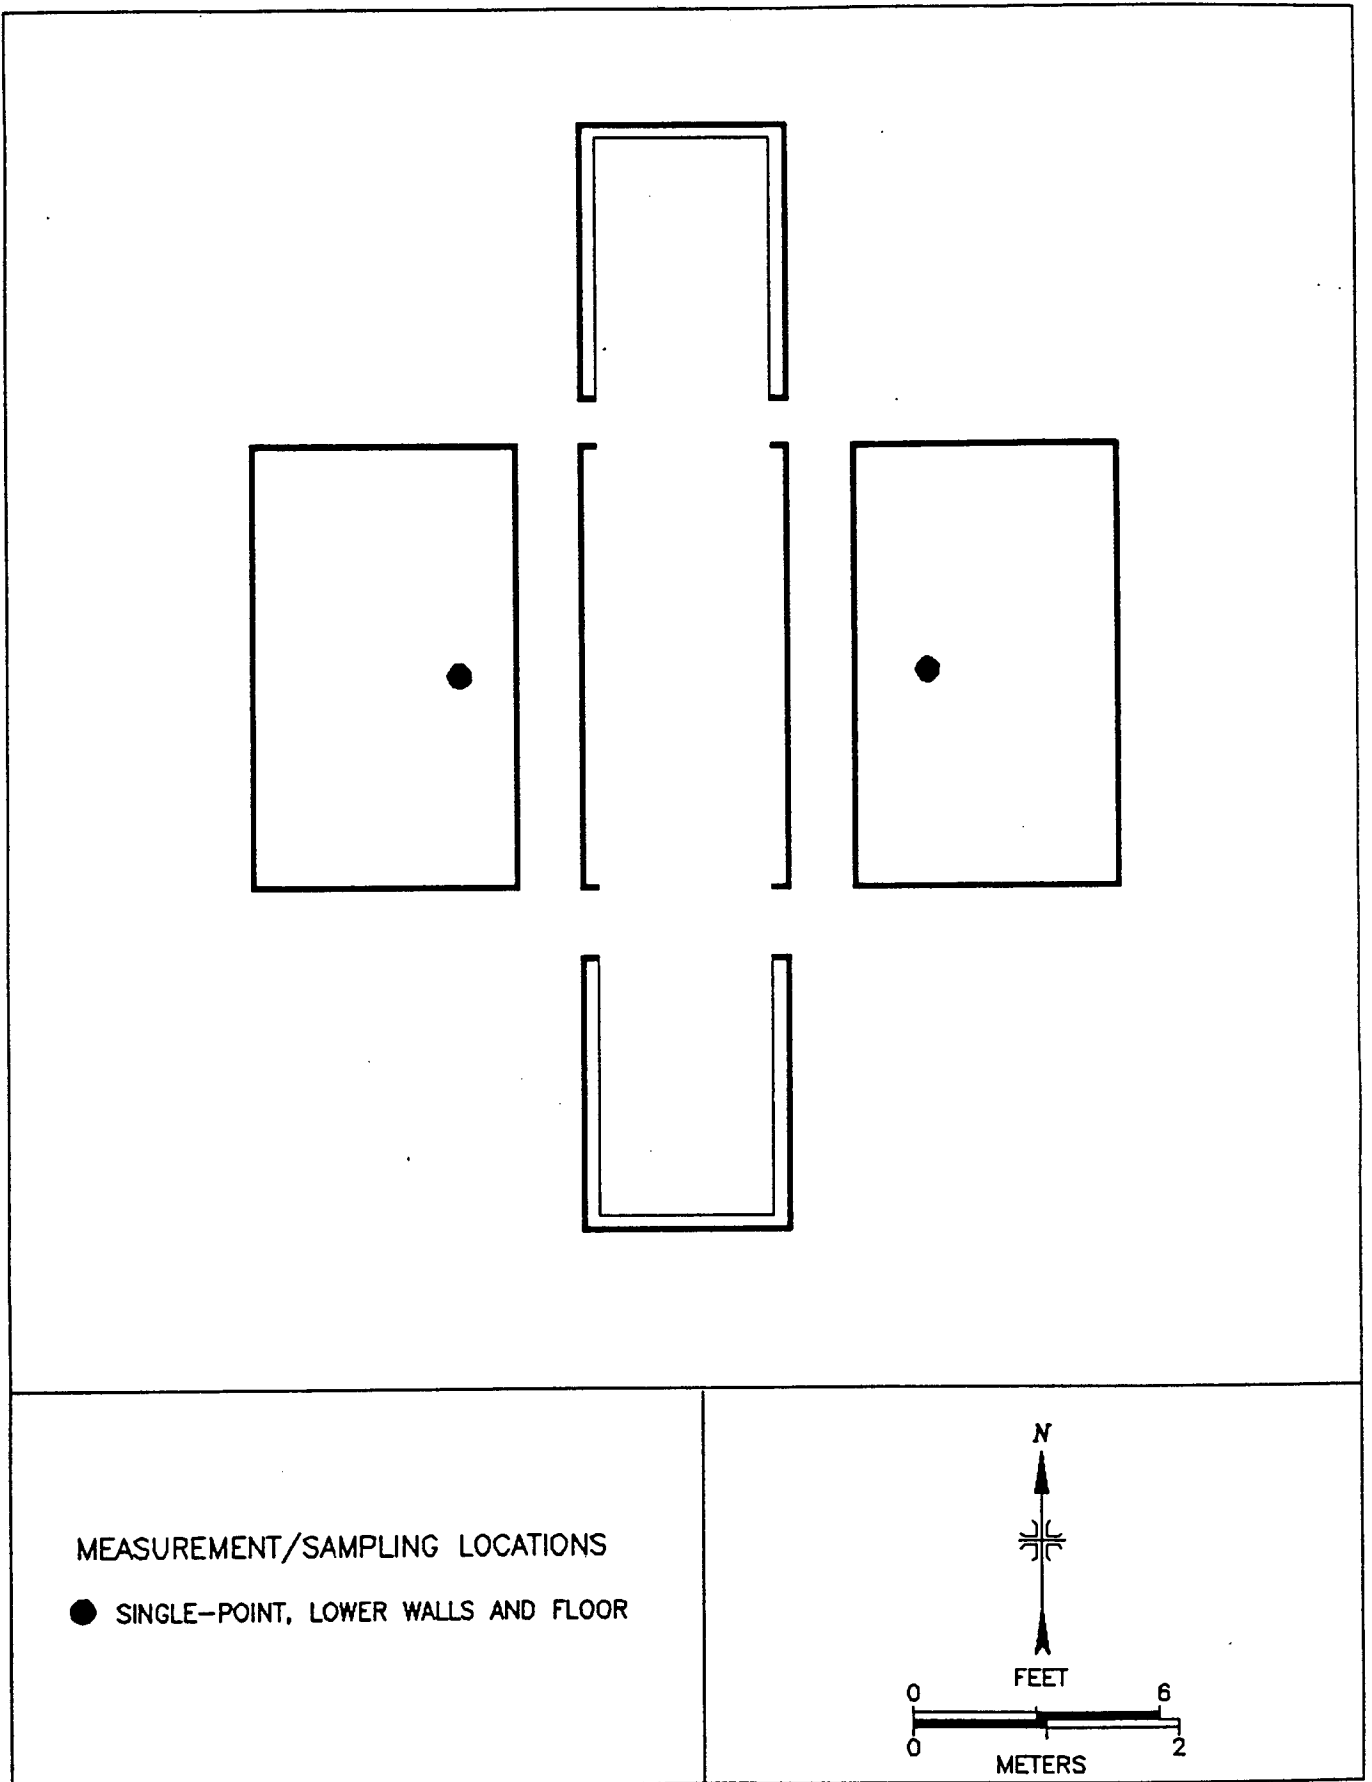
Building 402, Room 7 – Measurement and Sampling Locations
